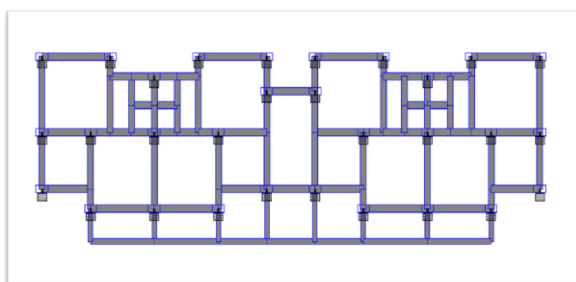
Typical G+3 residential plan used for the conventional and prefabricated Structure
